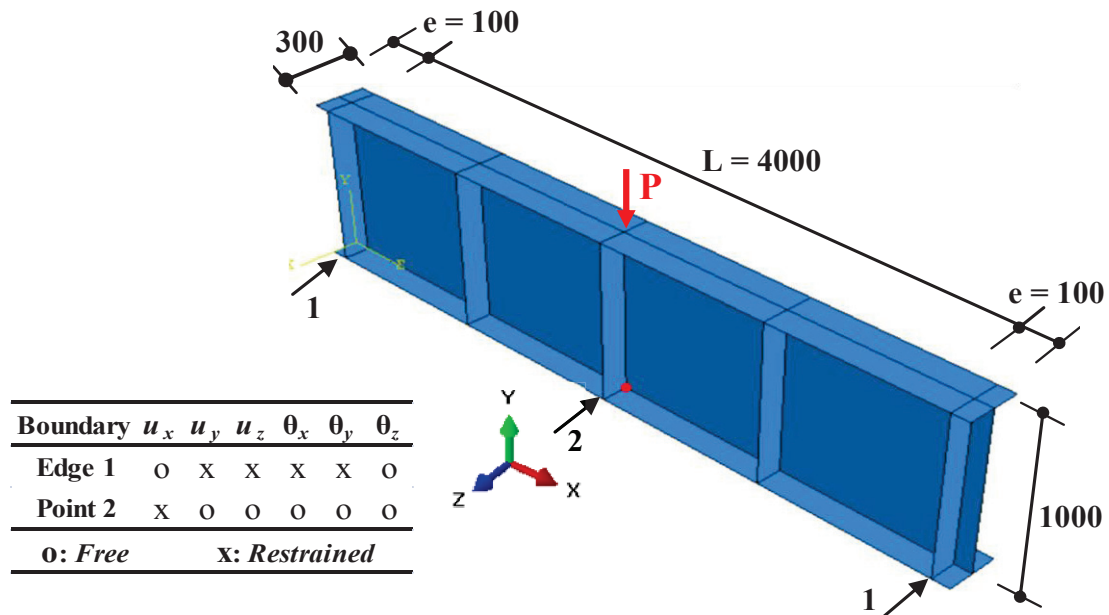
Detail dimensions of the girder model (Dimensions are in mm)
